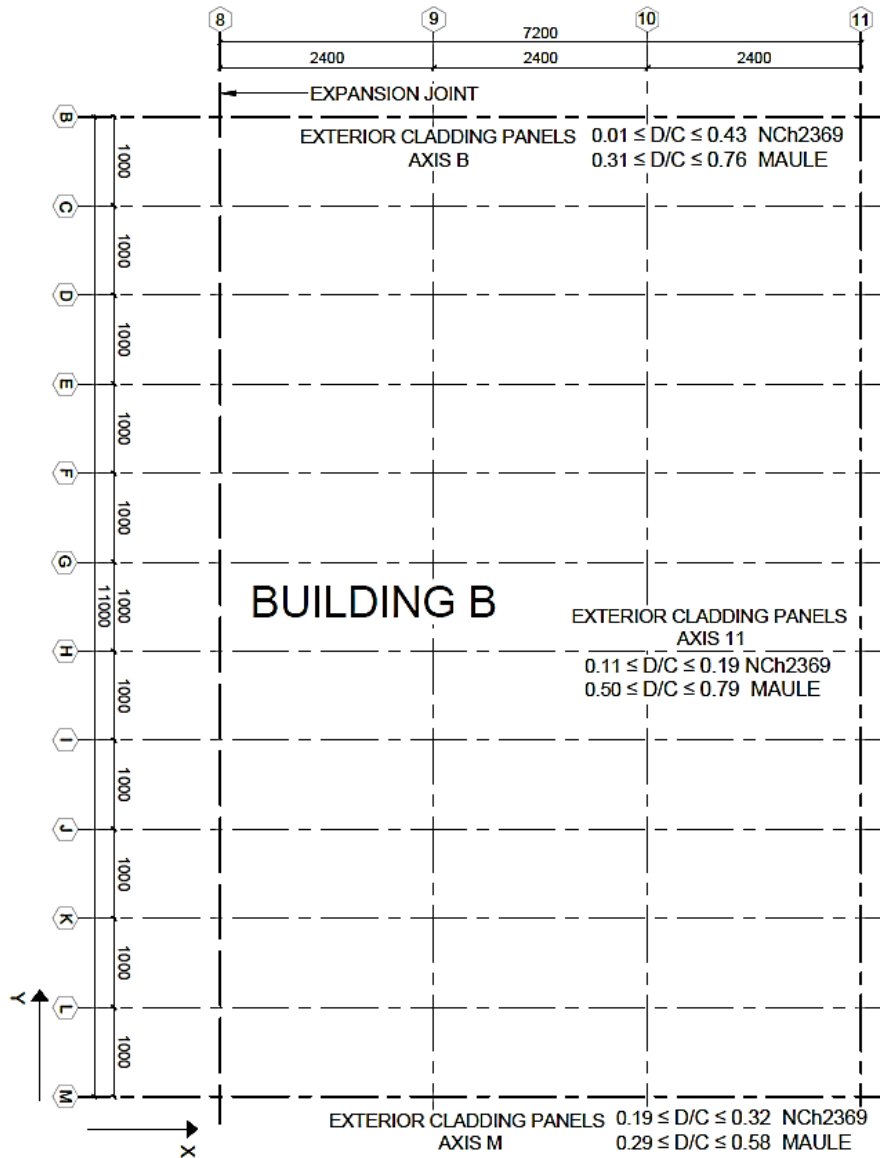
D/C Range for the connection of the cladding panels for Building B (units in cm).
